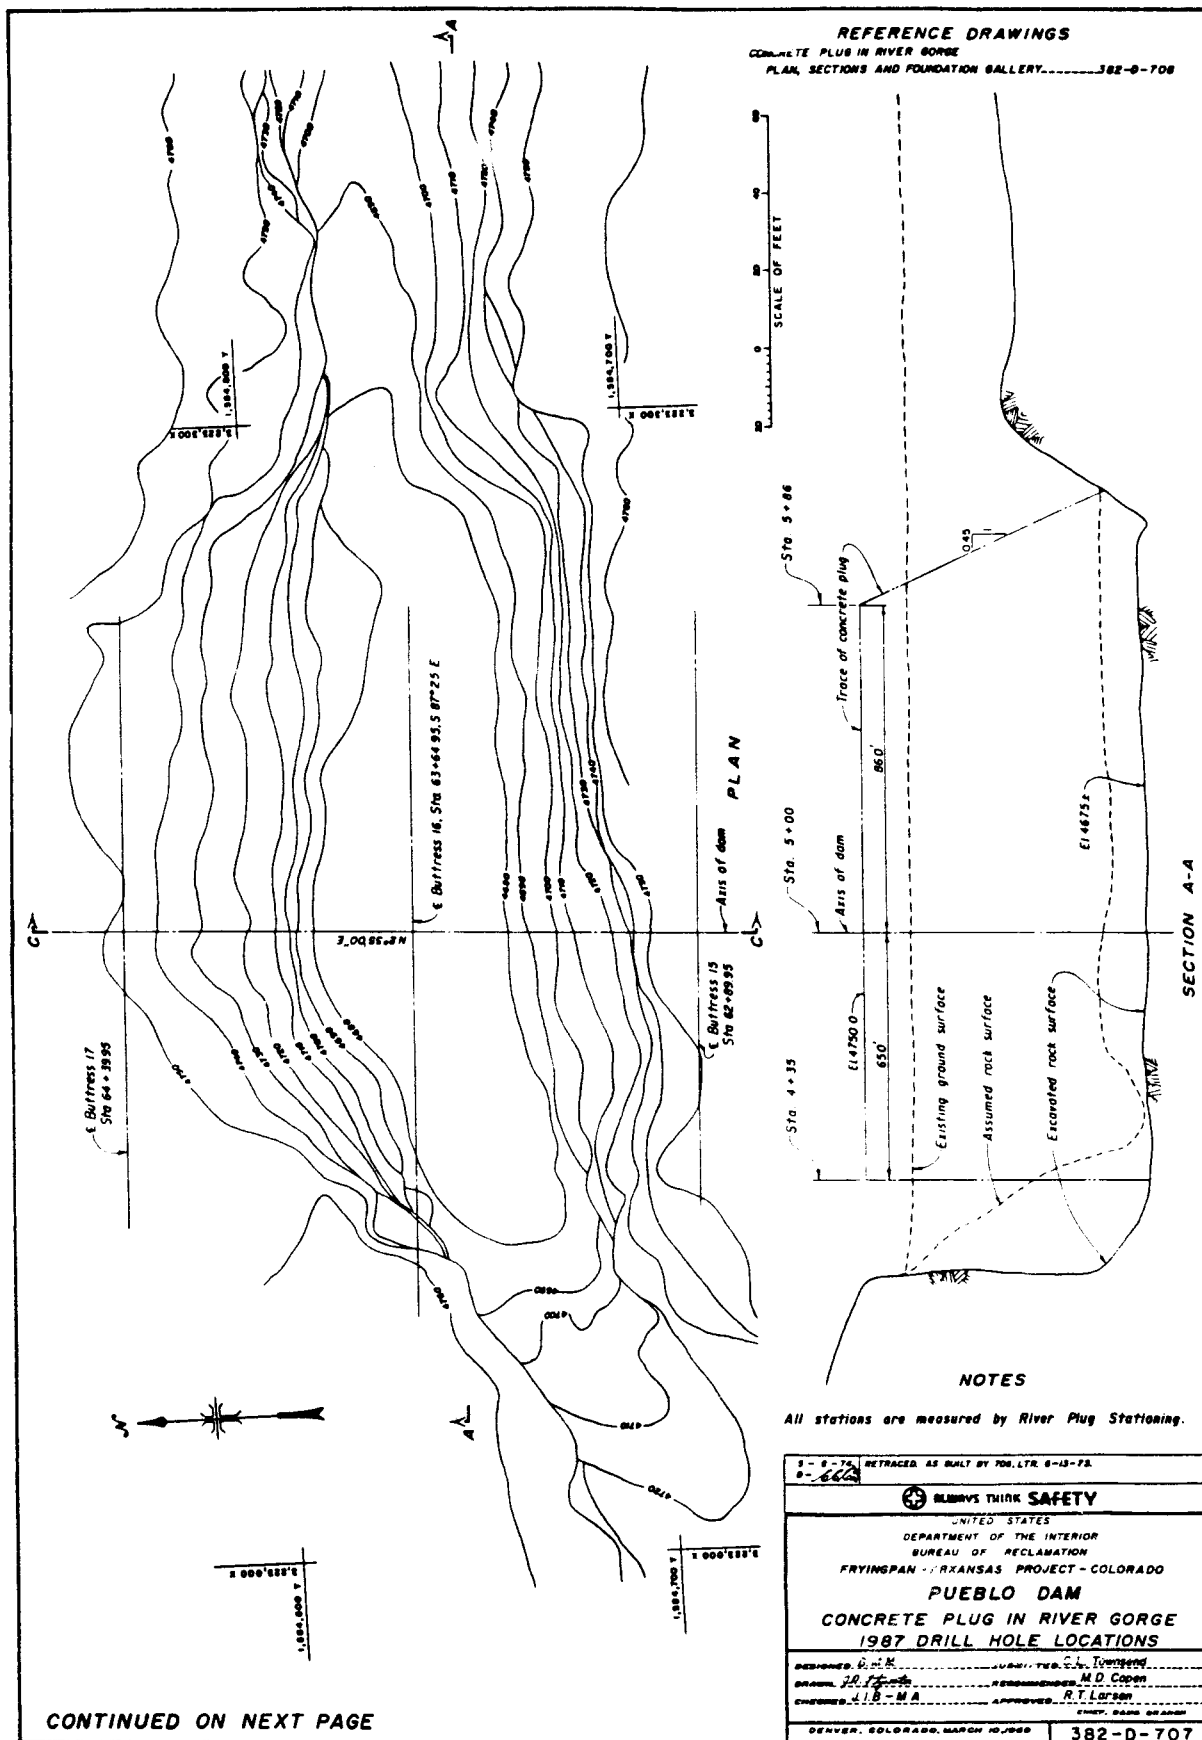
Pueblo Dam - concrete plug in river gorge - 1987 drill hole locations.
